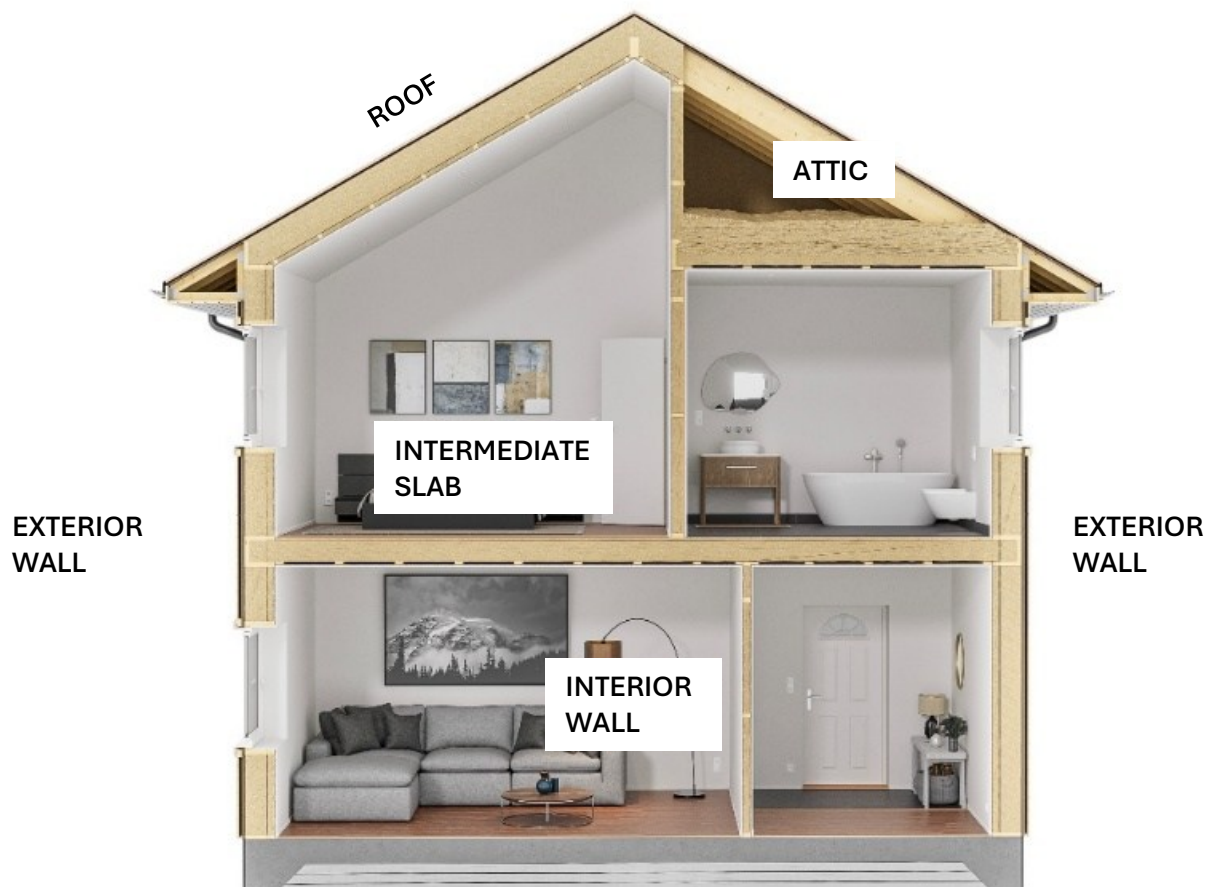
Cross-Section of a residential house showing application of hemp fiber insulation in walls, roof and intermediate slab
